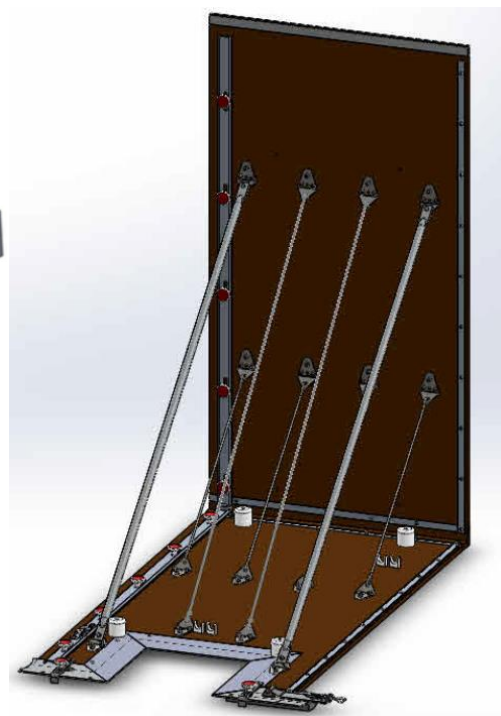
Side closures to connect flood barriers to a wall or fixed surface
